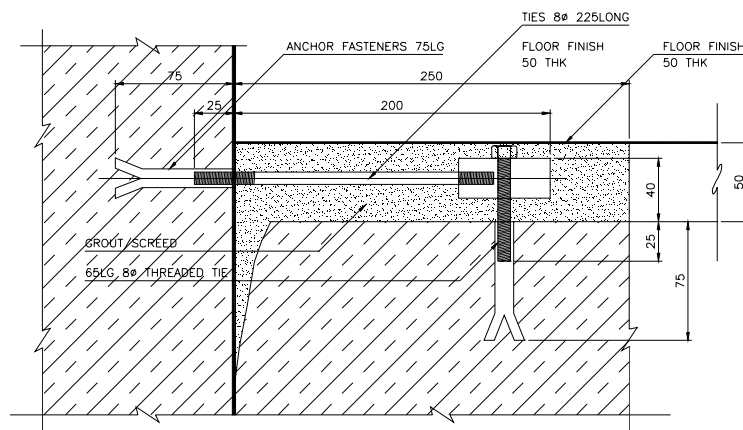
Detail of stitch between a vertical wall and the Horizontal plane
